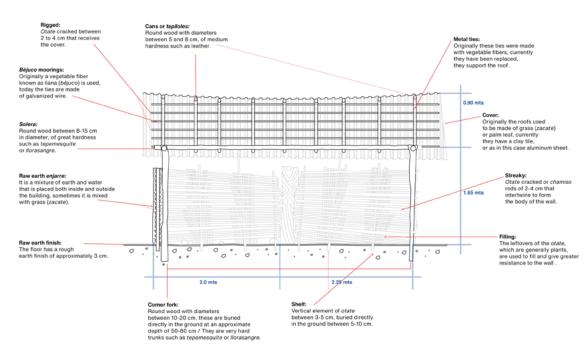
Cross-section of the facade of a *pajarete* house in which the construction system can be seen in detail (Drawing: Antonio Flores, 2017).
